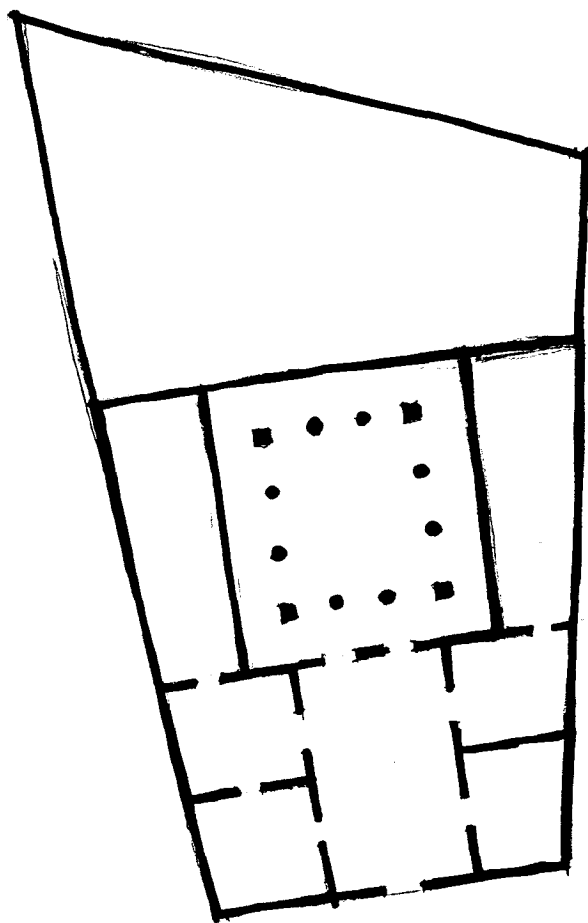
Palazzo Ricci: reconstruction of plan sketch from Uffizi 355v (author)
